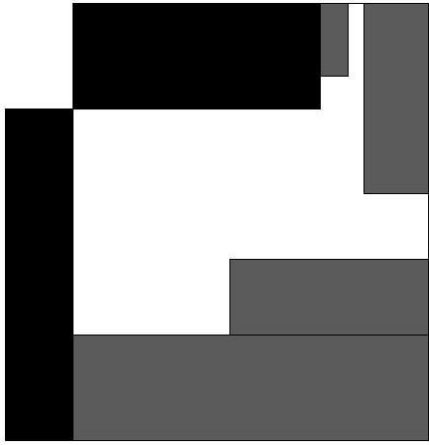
Schematic Ground Floor Demolished Plan of Zeyko Factory, Kyrenia
